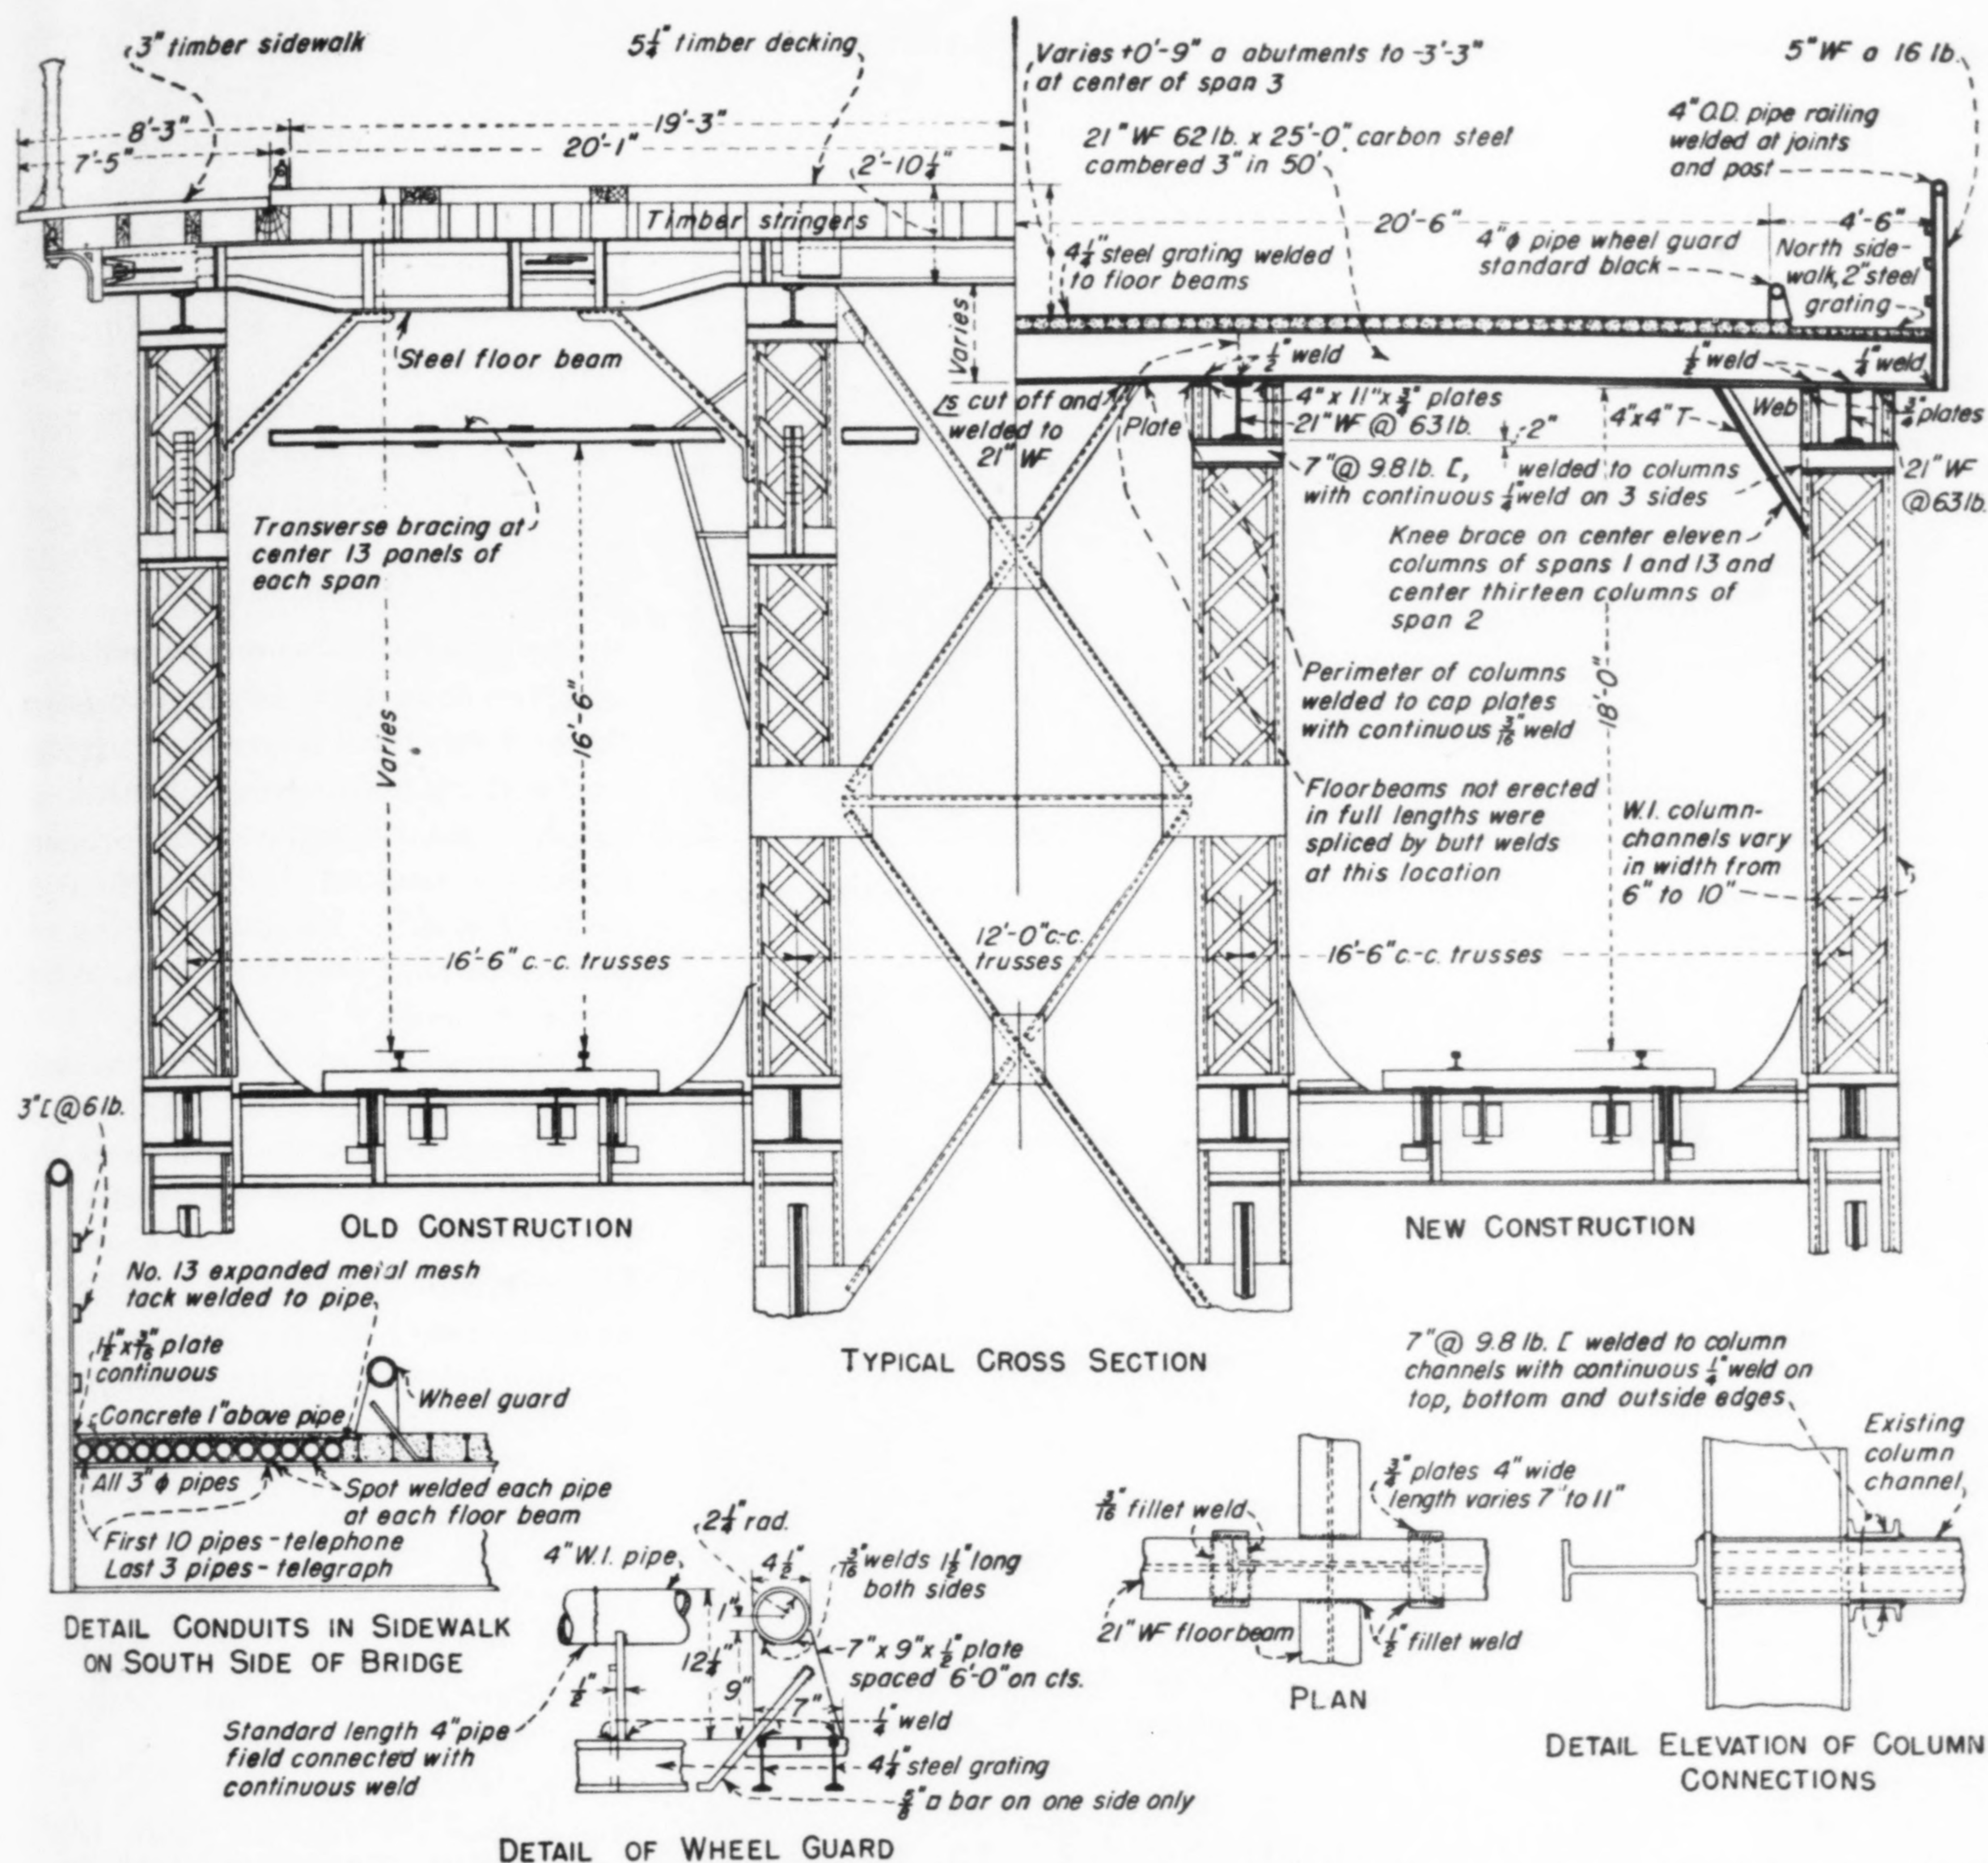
Reconstruction of upper deck of Eads Bridge, using steel grating with lightweight concrete fill on wide-flange floorbeams and longitudinal beams, with all connections field-welded, reduced the dead load 810 lb. per lin. ft., improved the width and gradients of the four-lane roadway, and increased vertical clearance above railroad tracks on the lower deck.
